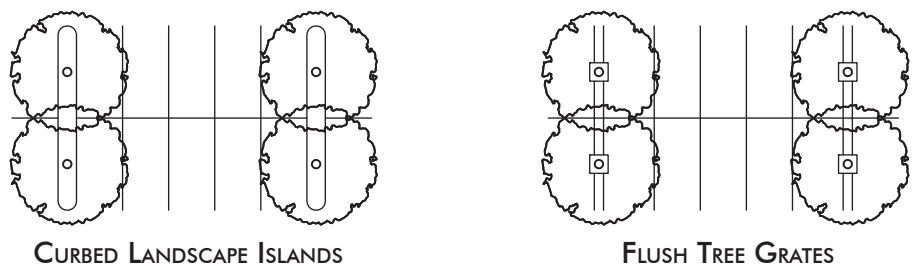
D.2 PARKING LOT LANDSCAPING
